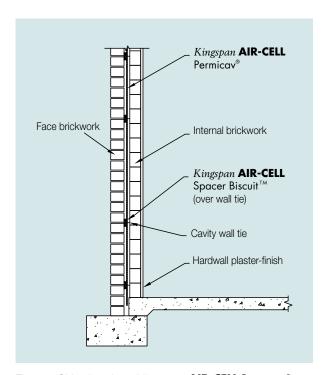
Side elevation of  $\it Kingspan$  AIR-CELL Permicav® in double brick cavity wall
